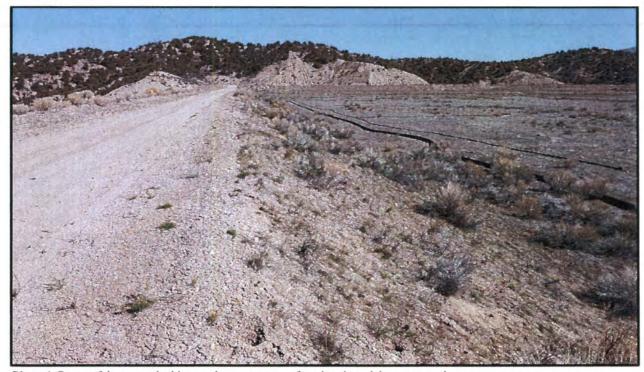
Center of dam crest, looking north over upstream face, beach, and dam crest road.
